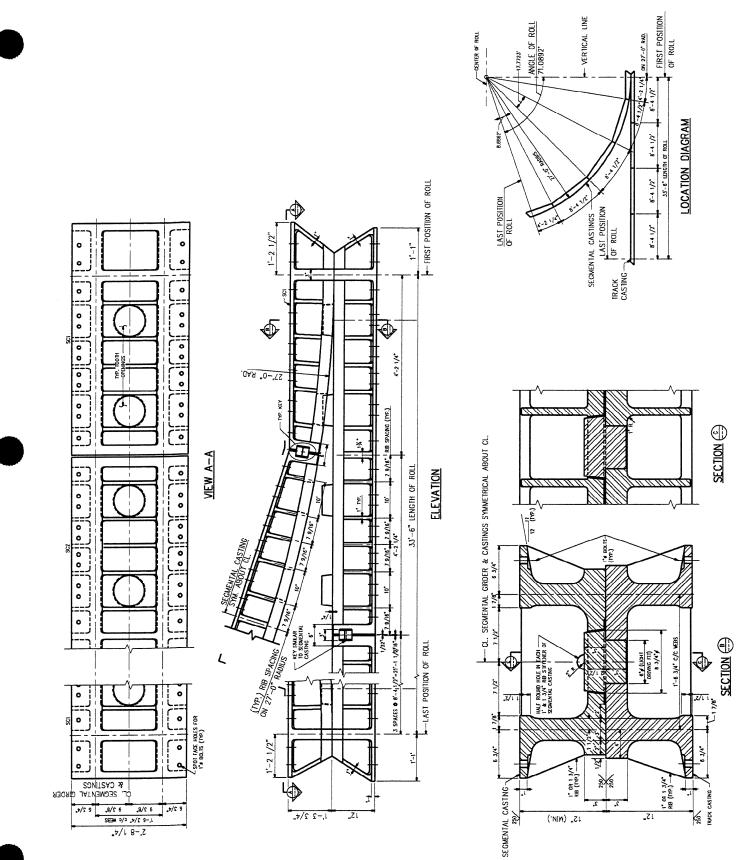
TYPICAL SEGMENTAL AND TRACK CASTING FOR RAILWAY ROLLING LIFT BRIDGE
